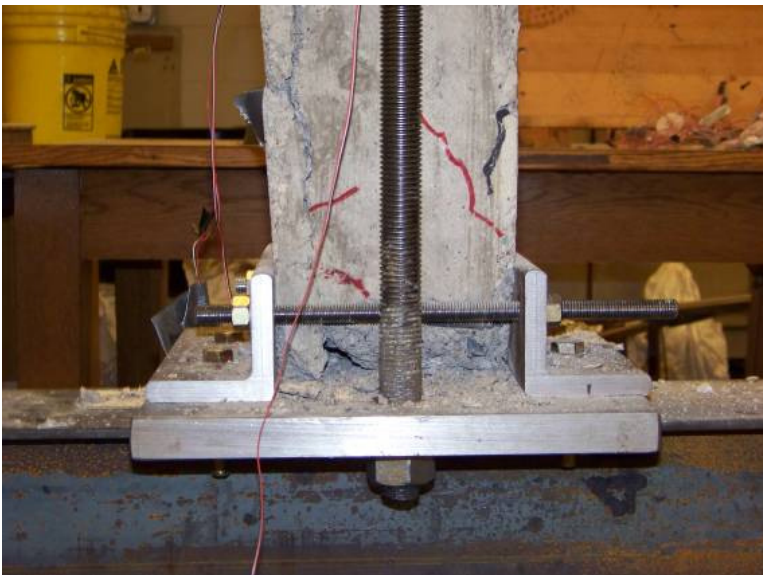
Specimen 3 column base at failure (Fisher 2009)
